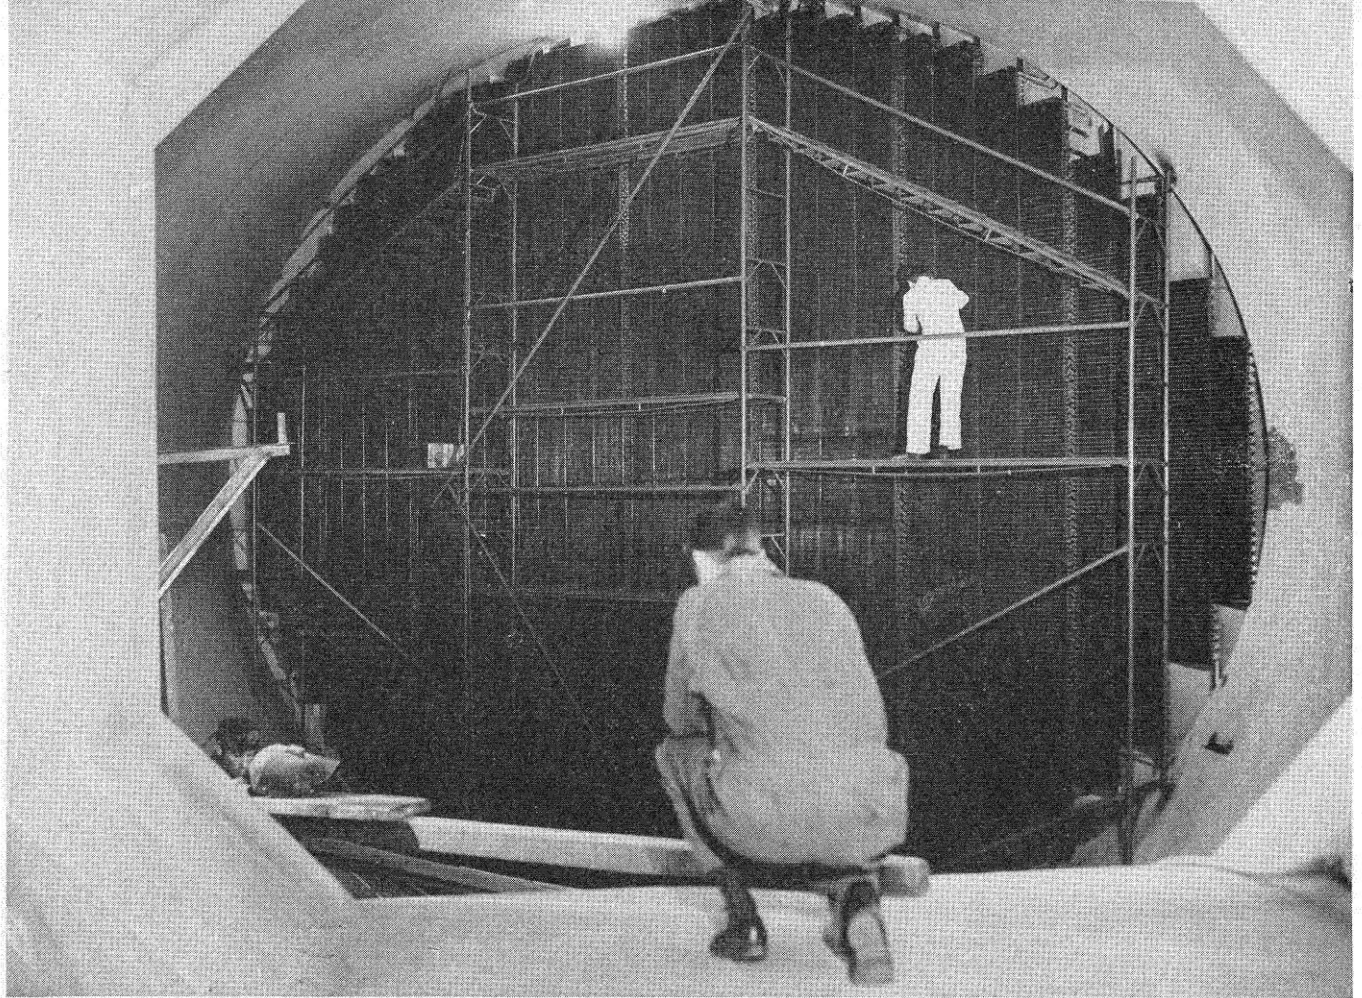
The cooling radiator at corner upstream of working section consists of 80 units of finned copper coils.
